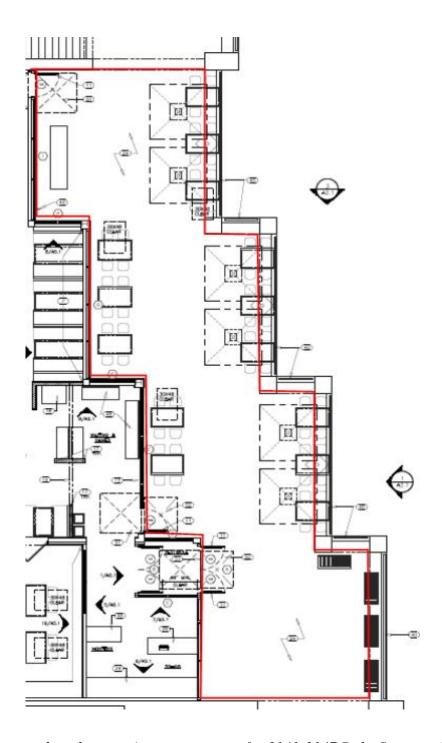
Proposed outdoor seating arrangement for 3141-3147 Duke Street outlined in red.
